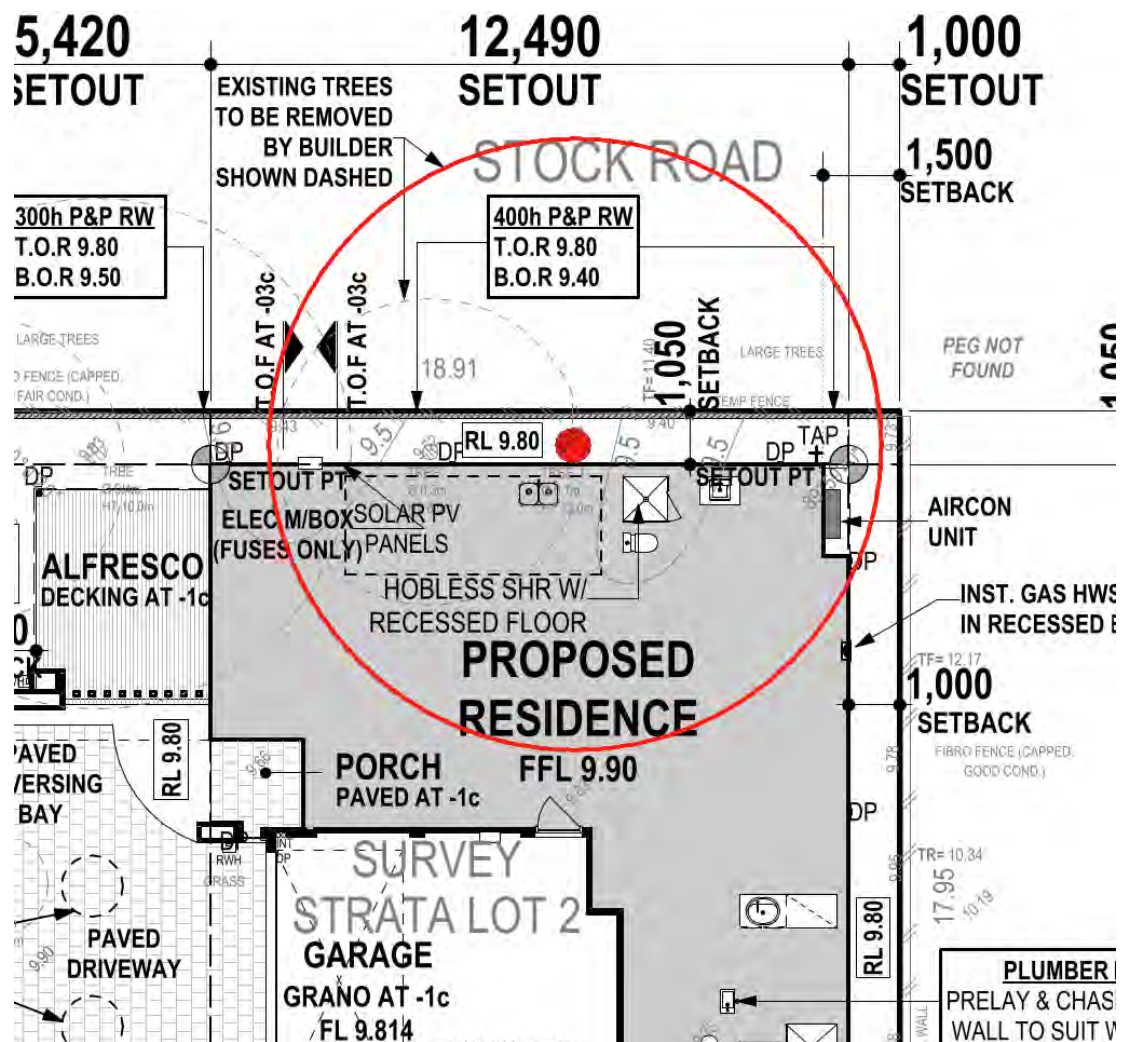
Existing White Cedar tree reference 1 marked for removal on the site plan
